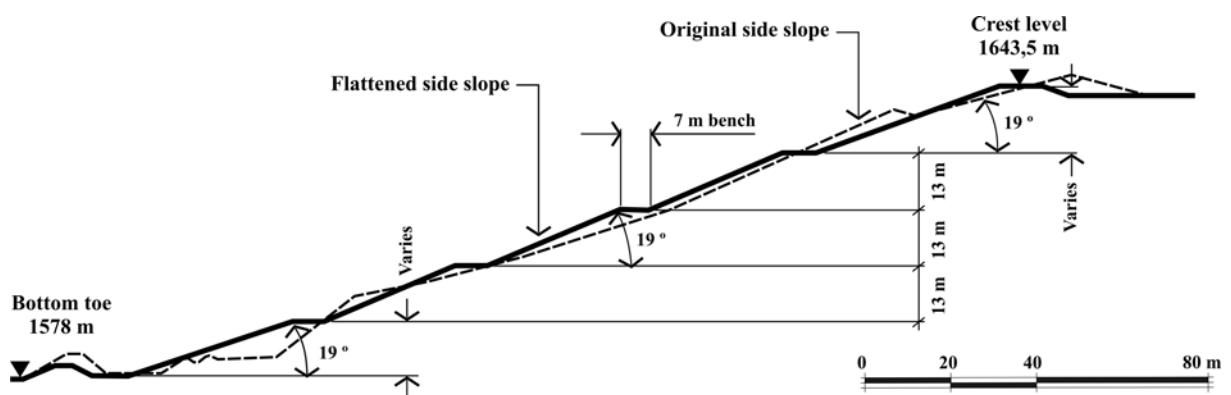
Typical section through ERGO Daggafontein tailings impoundment embankment.
